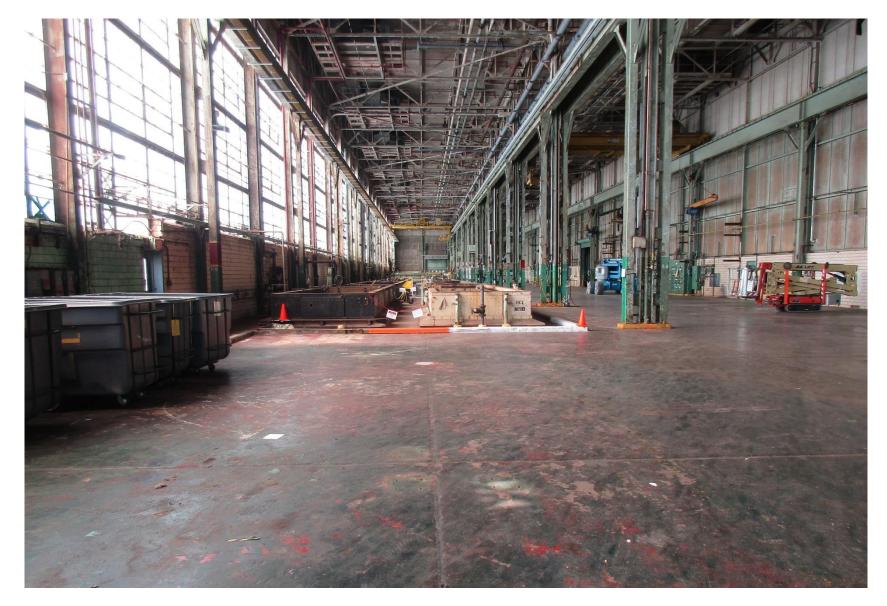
East Side Interior of the C-400 Cleaning Building Facing South (2017)
